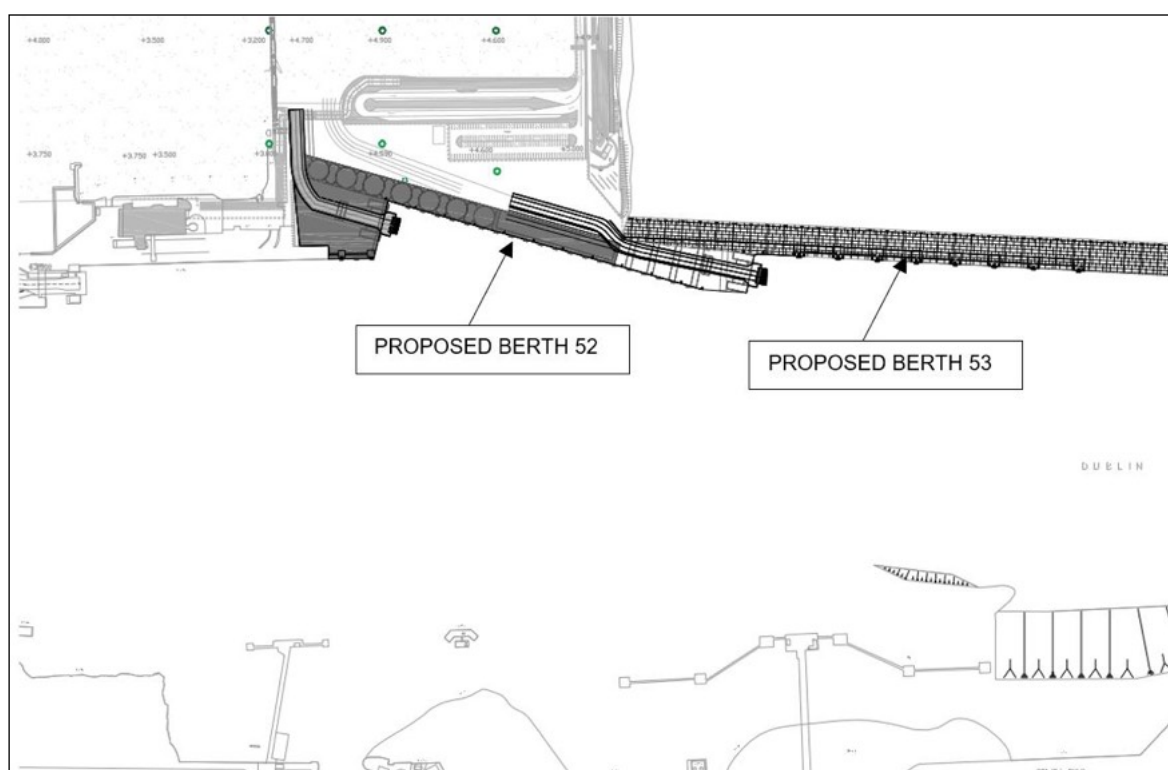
Berth 52 / 49 Proposed Layout (Option G)
